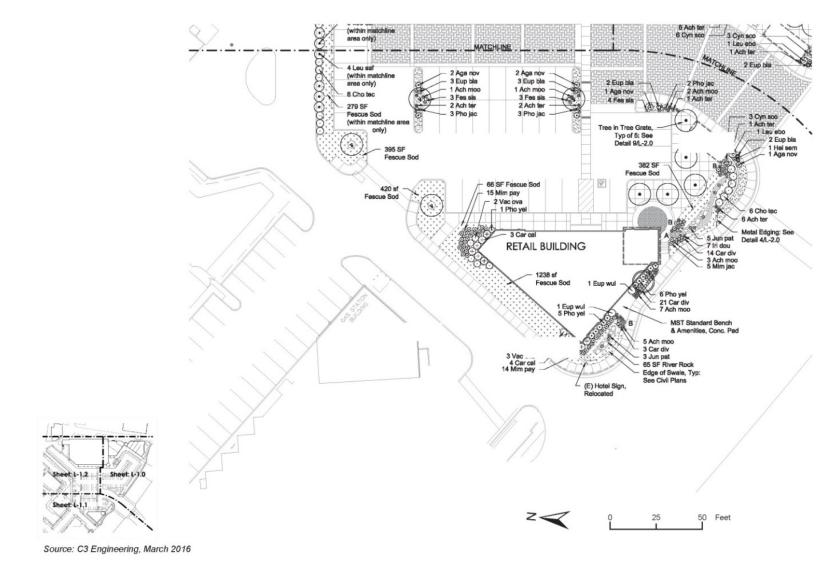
Preliminary Landscaping Plan: Sheet L-1.1
